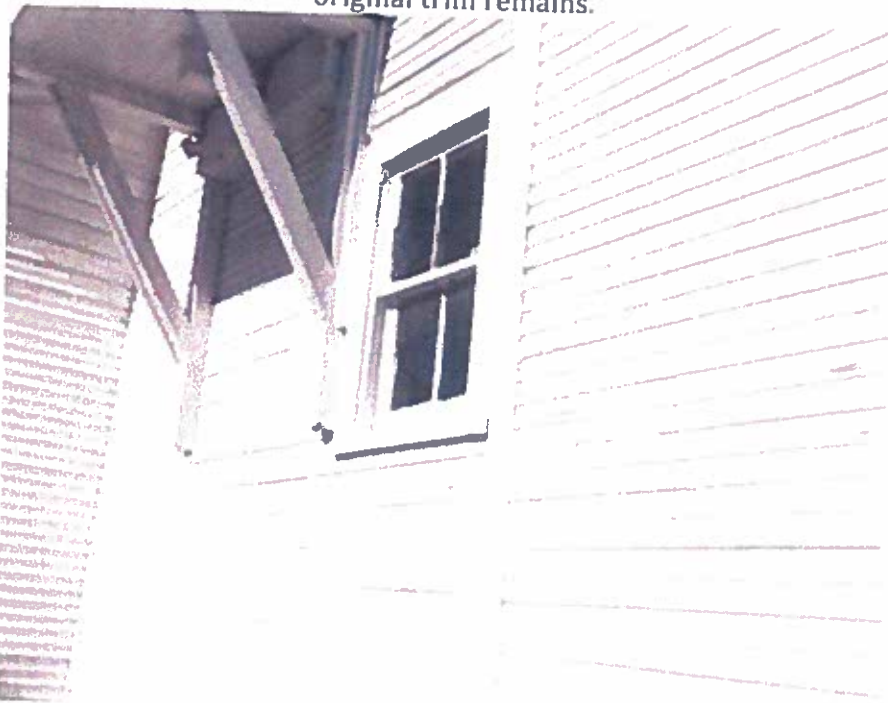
1<sup>st</sup> floor kitchen window facing south. The window has been replaced but some original trim remains.
